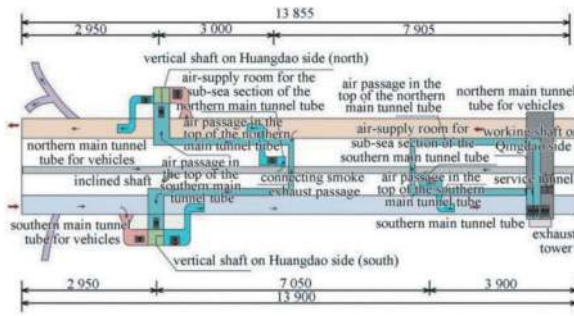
Ventilation mode of section 2.5 with a shaft on the shore of Huangdao.
